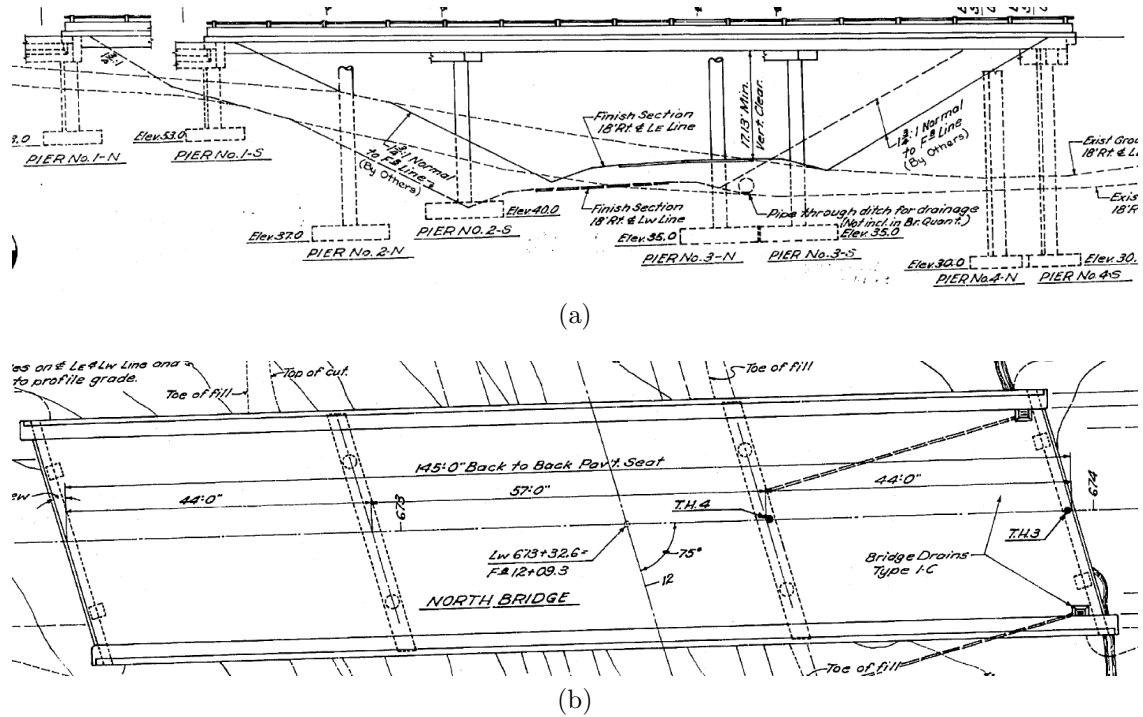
Bridge 3 in (a) elevation and (b) plan view
